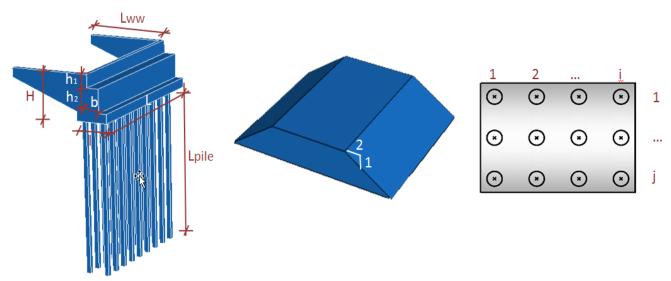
Configuration of a typical seat type abutment-embankment system studied
